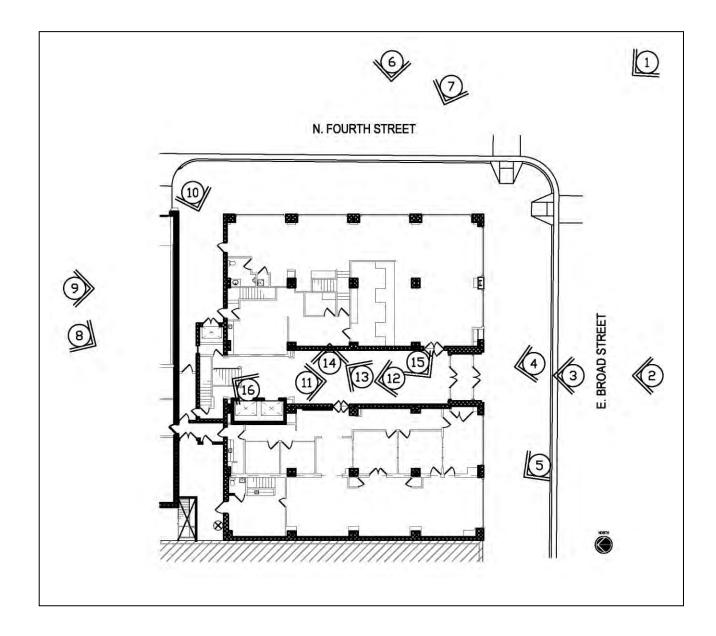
Existing Floor Plan & Photo Key – Exterior & First Floor
